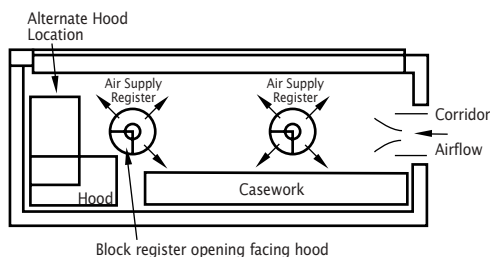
Laboratory layout showing hood located away from exits and potential airflow disruptions
